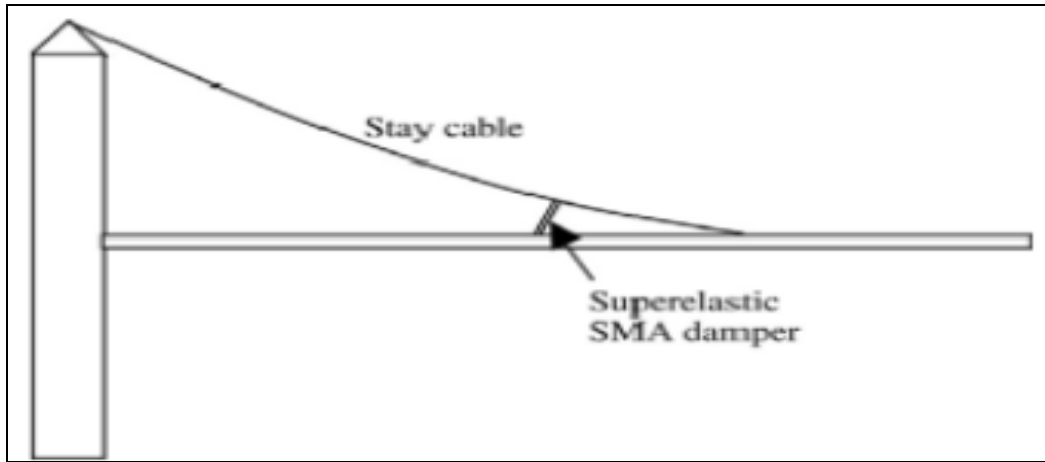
Stay-cable bridge (Li et al., 2004)
